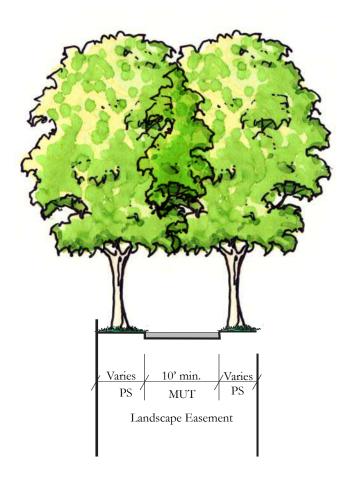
Conceptual Multi-Use Trail Next to Local Street Segment
